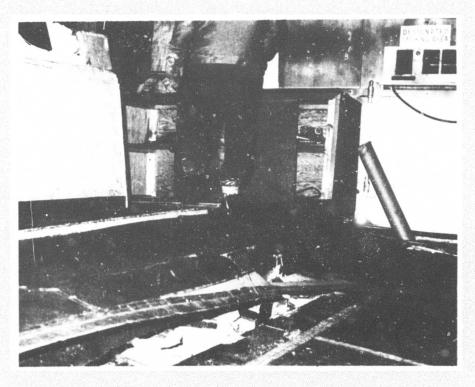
Tearing of maintenance shop floor as a result of trench floor arching.
